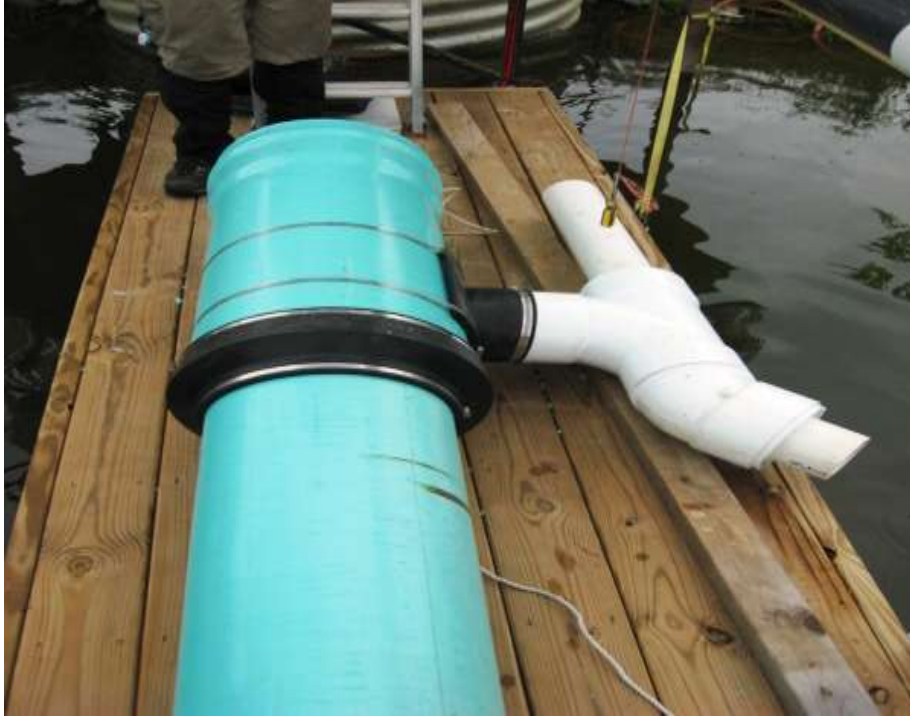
15 inch diameter receiver pipe, the 12 inch diameter riser pipe, and the 6 inch auto burper. A 4 inch flexible pipe is connected to the auto burper on the lower right.
